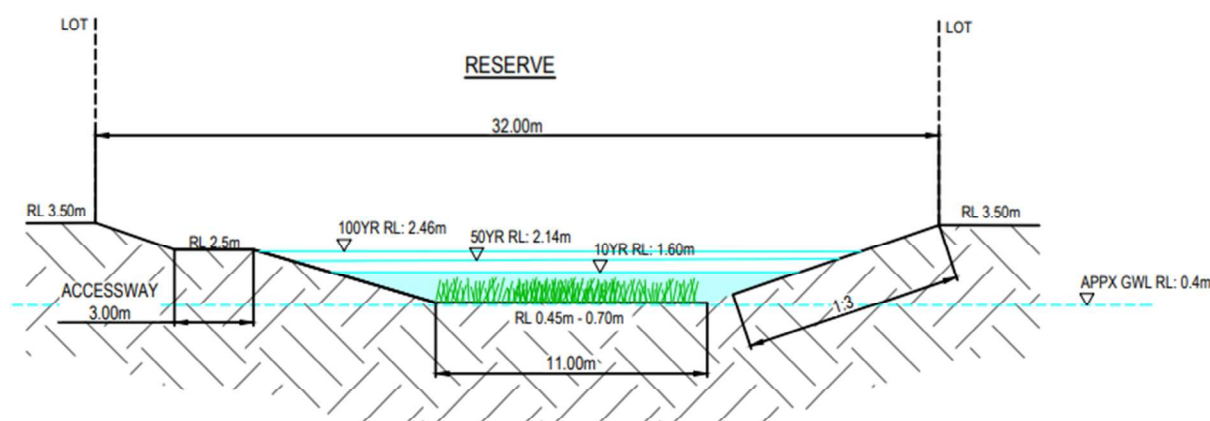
Typical Swale Cross section (C400s - Appendix D of the AEE)
